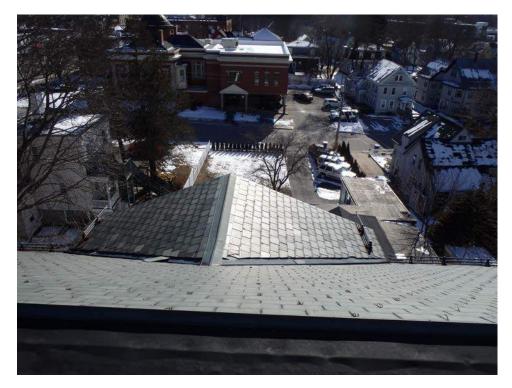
Red copper ridge and valley flashing; note snowrails at roof edge
